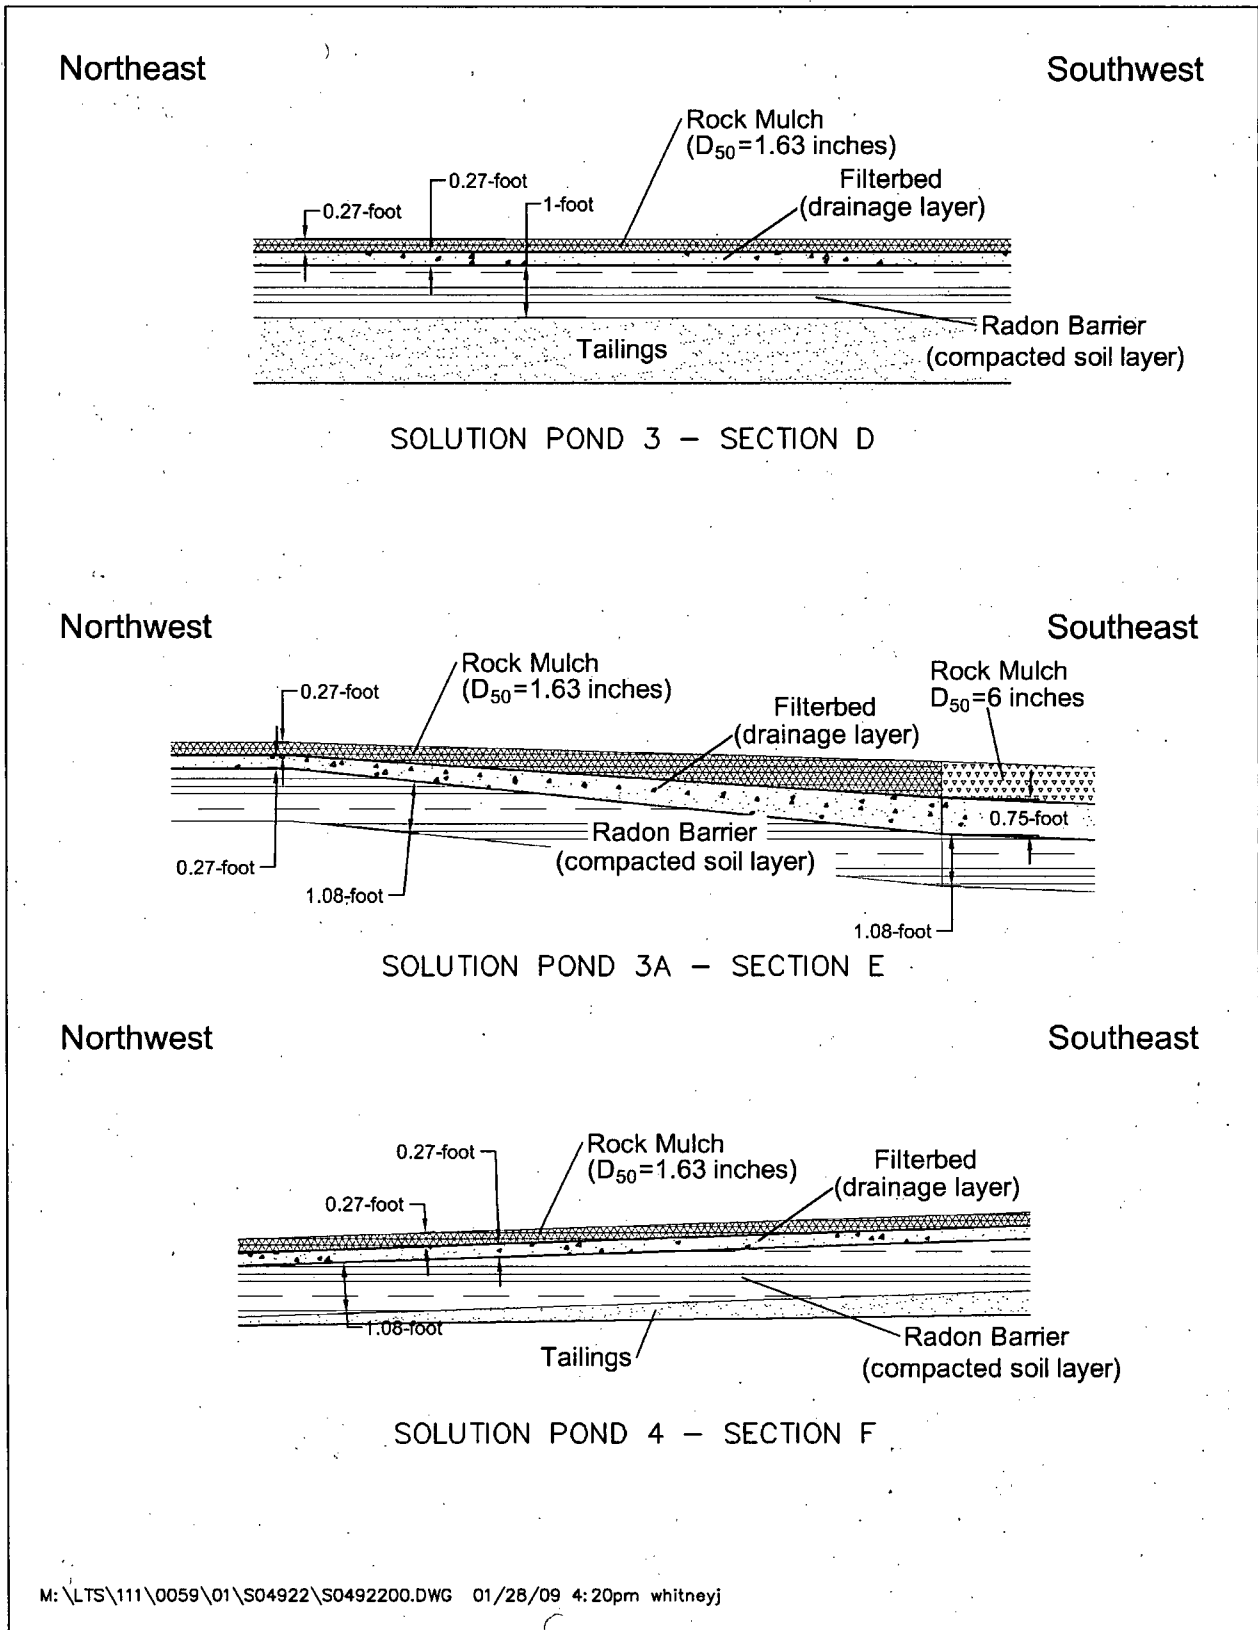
Cross Section of the Engineered Covers on Solution Ponds 3, 3A, and 4 at the Gas Hills North, Wyoming, Disposal Site
